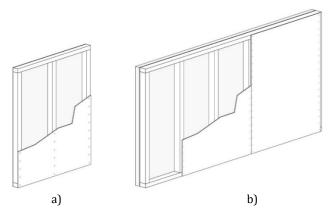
a) Single-panel and b) Macro-panel prefabricated LTF wall element [16]
